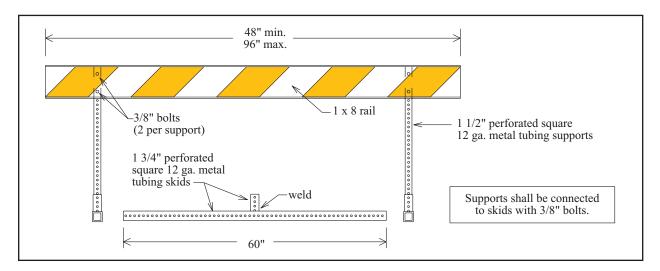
Generic perforated square metal tubing skid-mount Type-I Barricade
